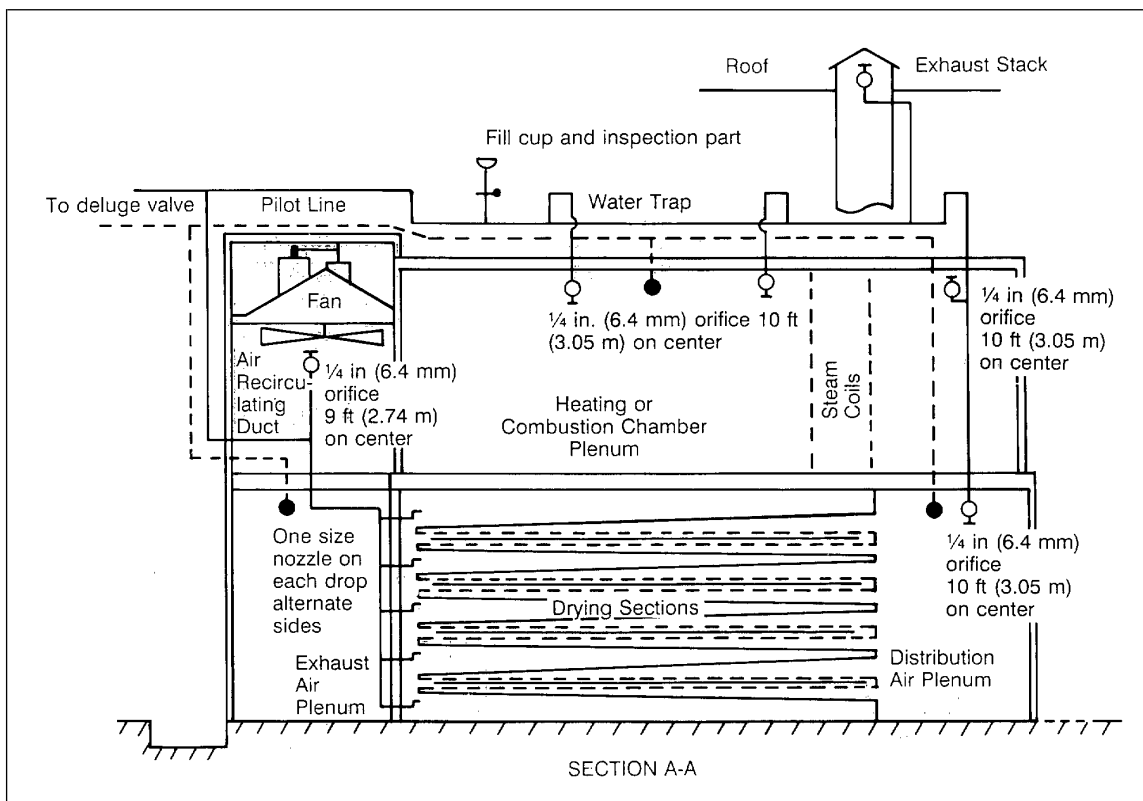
Typical arrangement of deluge protection for vertical jet-type dryer. Section A-A of dryer shown in Fig. 6.
